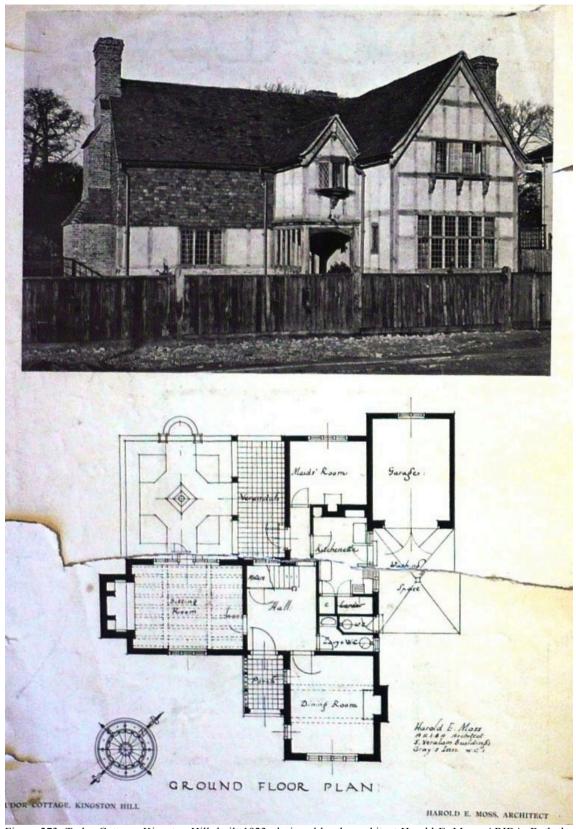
Tudor Cottage, Kingston Hill, built 1923, designed by the architect Harold E. Moss, ARIBA. Both the facades as well as the floorplan share many similarities with 2 Monkhams Avenue (*Bungalows and Small Country Houses*, The Architect [London, 1925]).
